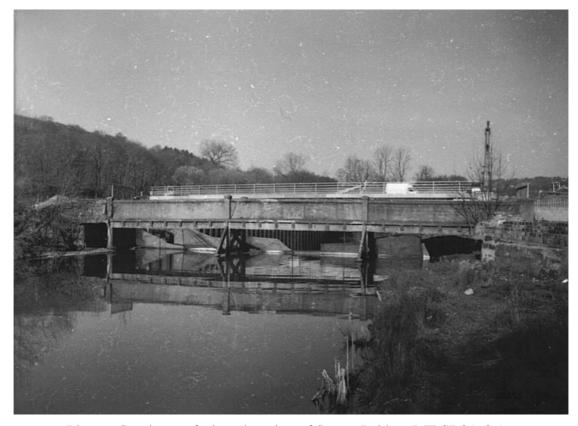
South-east-facing elevation of Sterne Bridge (MF SB01_06)
